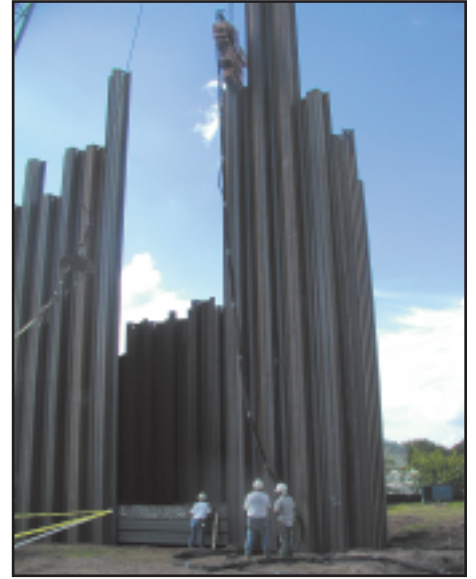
Cofferd Cell Sheet Piling Installation for the Tampa Bypass Canal Pump Station Expansion
